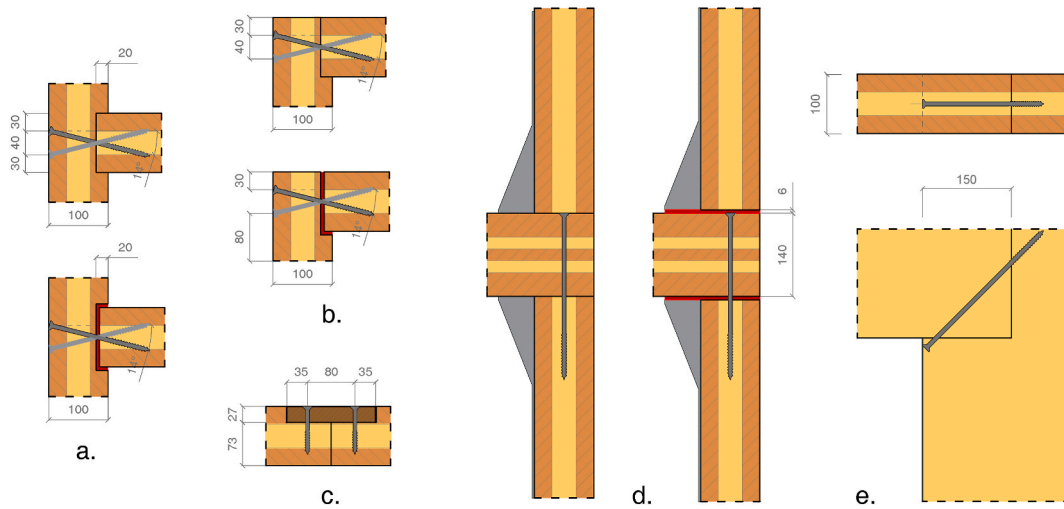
Timber-to-timber joints layouts, without and with insulation layers (in red): a) wall T-joints; b) wall L-joints; c) wall in-plane spline joints; d) wall-to-diaphragm joint (with hold-down brackets); e) lintel-to-wall joint. (For interpretation of the references to color in this figure legend, the reader is referred to the Web version of this article.)
